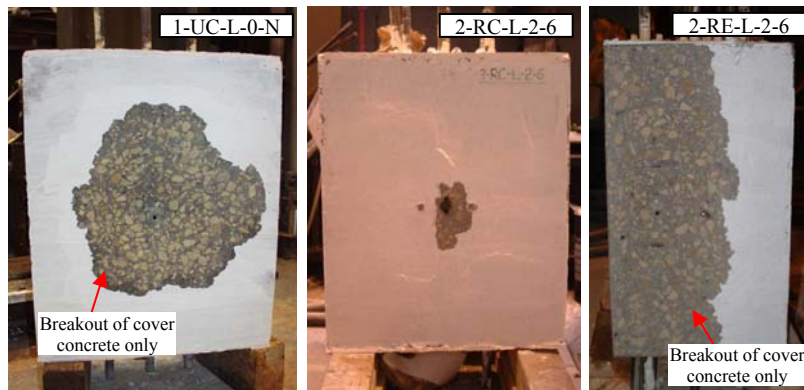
Concrete breakout patterns for cases of steel failure.
